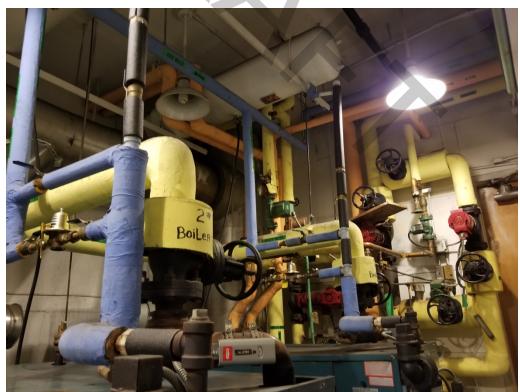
Presumed ACM TSI in the boiler room. Flue in back corner is assumed to contain ACM insulation. (May 22, 2018)
